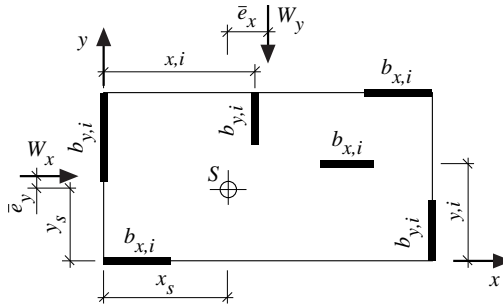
Shear walls, statically indeterminate system. (STEP 1995 Article E14)
